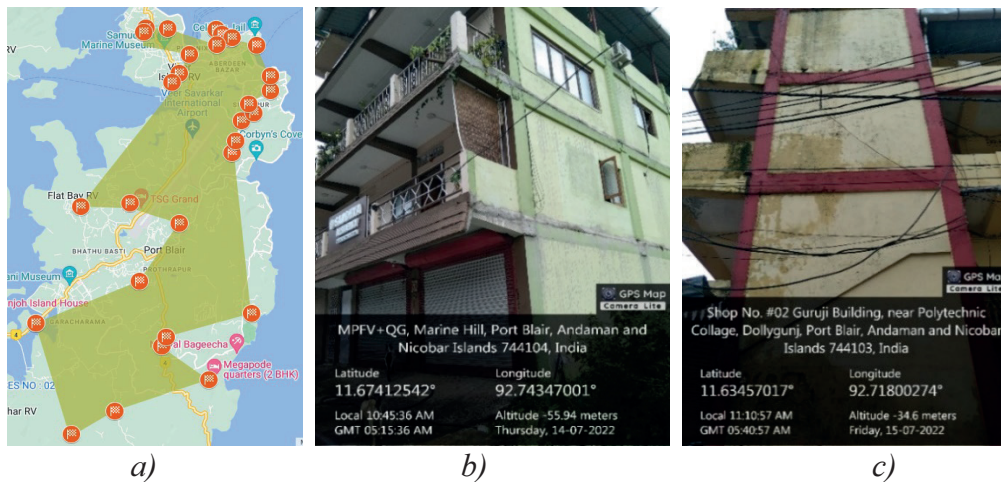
(a) area covered in the city (b) & (c) Elevation and external condition of building samples
